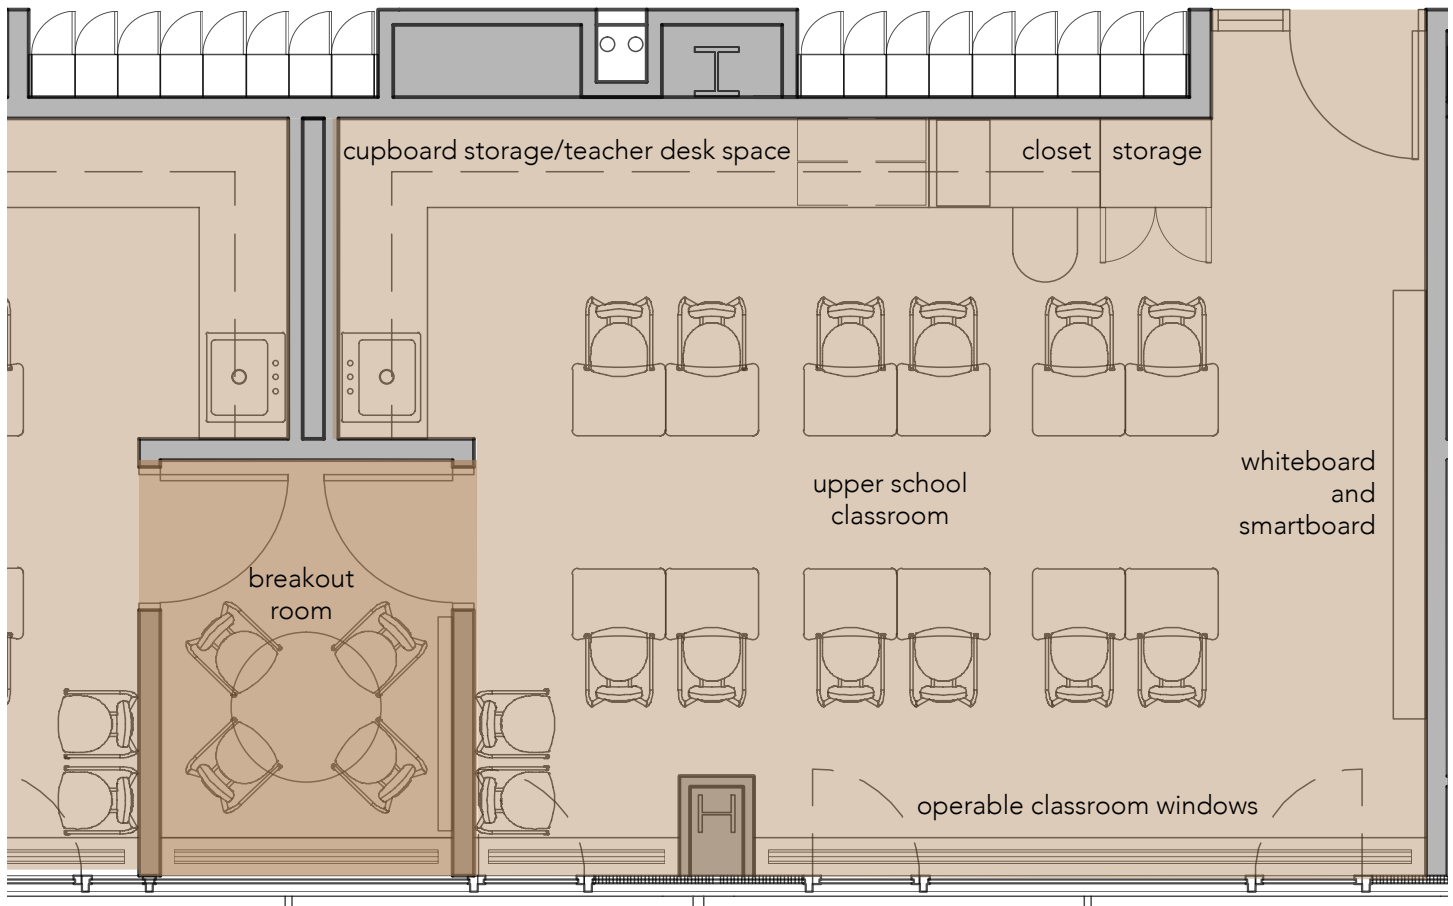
Level 4 Classroom Floor Plan Space Diagram; Floor Plan Source: Platt Byard Dovell White Architects
